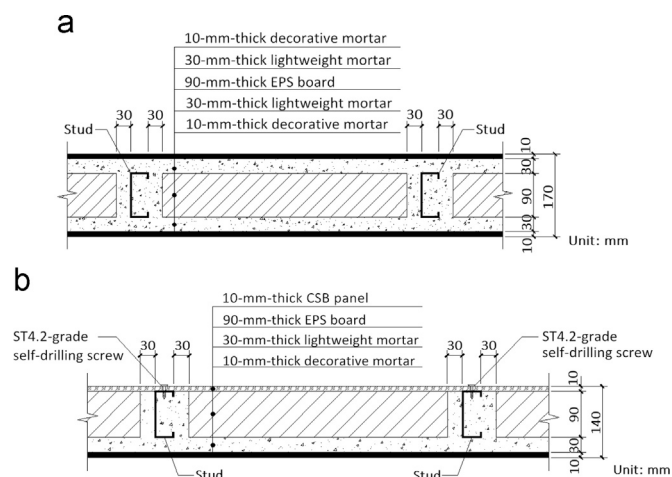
Details of wall specimens: (a) wall specimen with SLM on both sides and (b) wall specimen with SLM on the front side and CSB panels on the back side.
